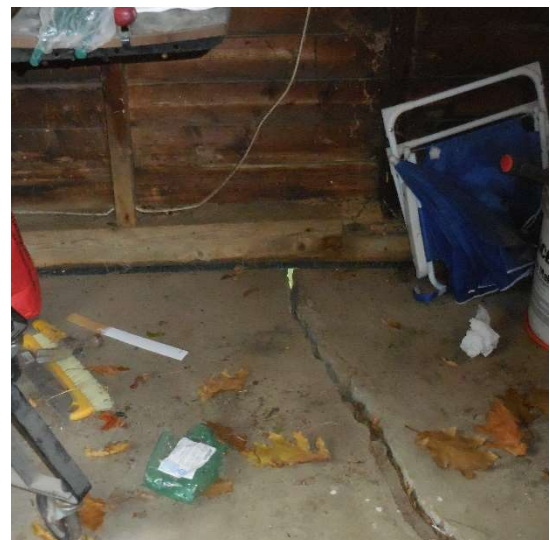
Slab - Note width of crack and visible daylight at end of crack where it becomes the foundation on west side
